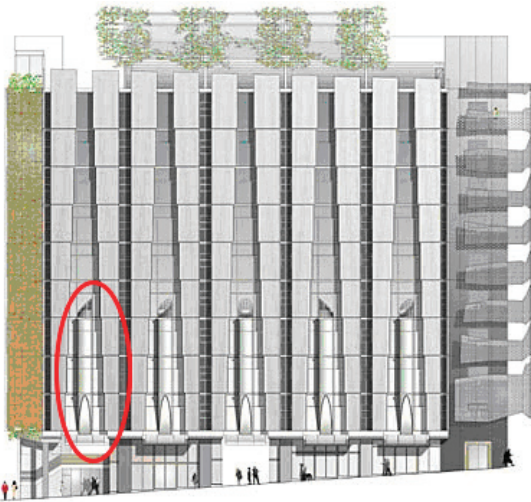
Shower towers on CH2 southern façade (DesignInc Melb)
